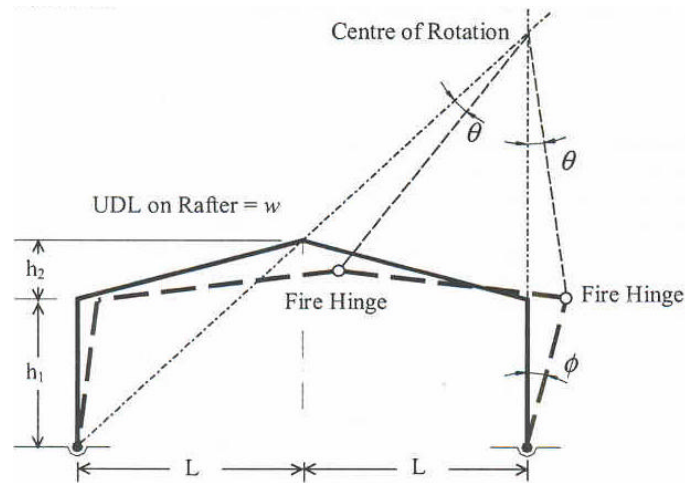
Failure mechanism for a pinned base steel portal frame fully exposed to a fire (Wong *et al.*, 2000)
